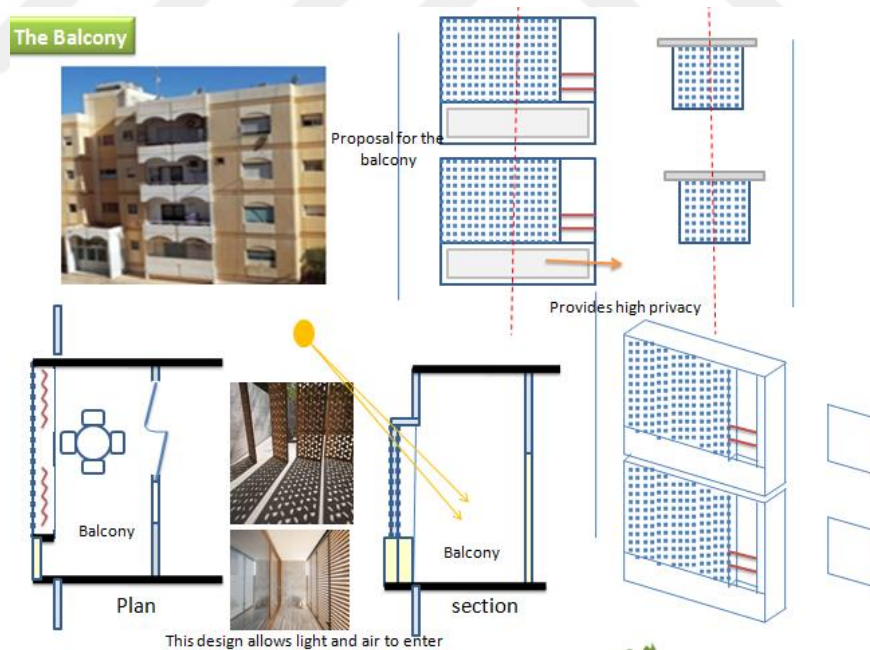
Solution for existing DH and AP 3; the wooden cover of the balcony provides high levels of privacy in addition to lighting and ventilation without affecting privacy.
